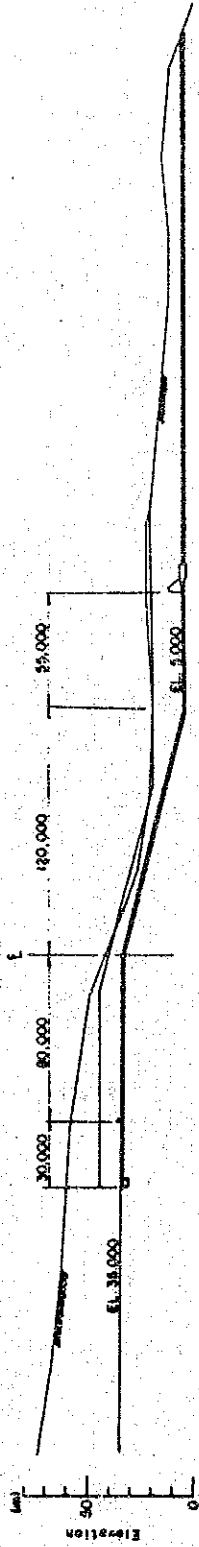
SPILLWAY PROFILE & CROSS-SECTION
